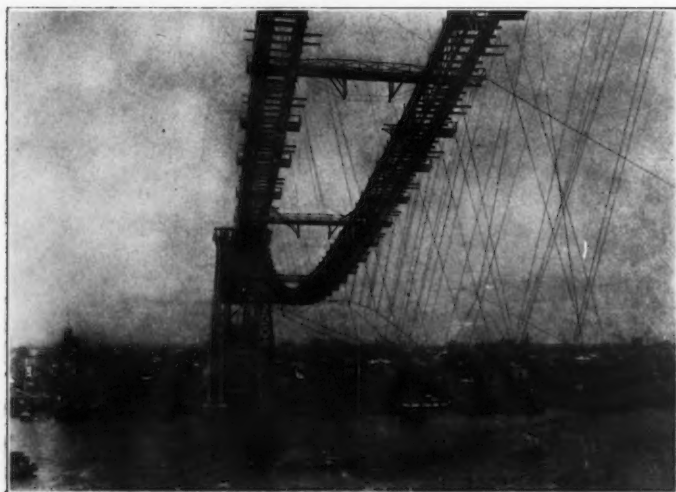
MAIN SPAN OF FOOTBRIDGE WITH STORM CABLES AND GUYS IN PLACE.
